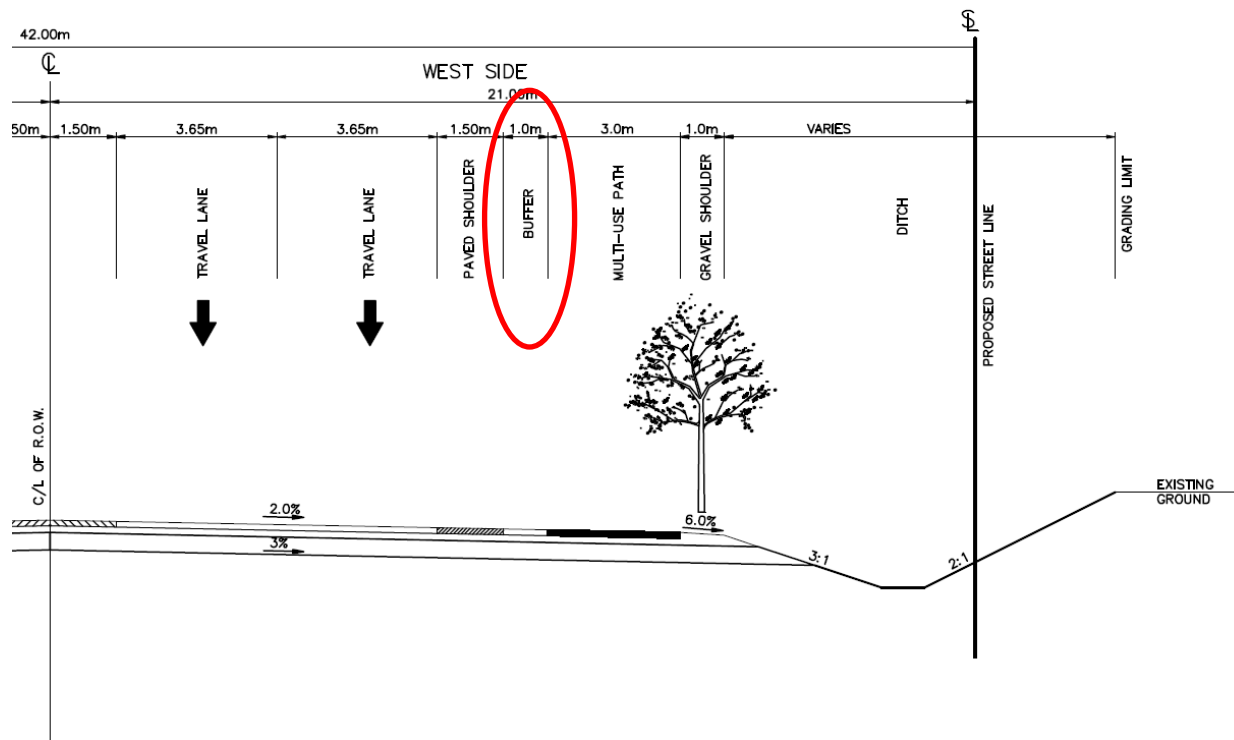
Porous Buffer between Paved Shoulder and Multi-use Path in “Rural” Cross Section
